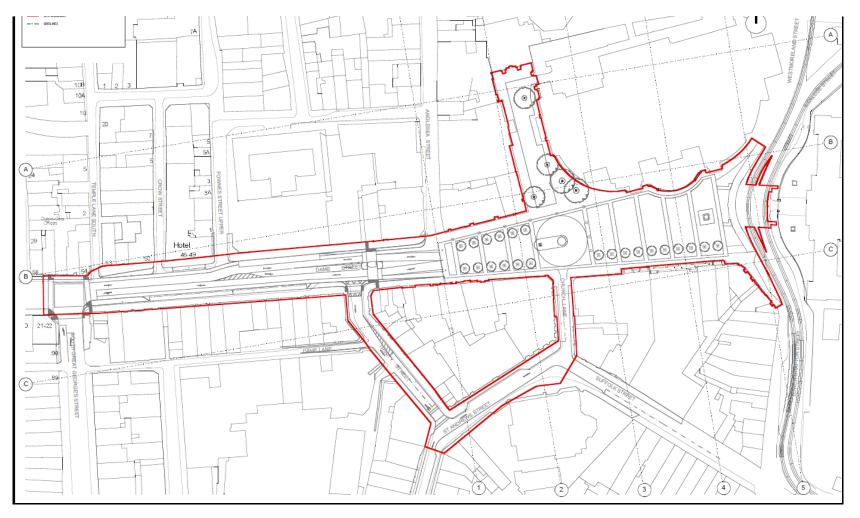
The Proposed Project (Refer to Figures 4.4 - 4.9 for details on road design. Refer to Figure 4.11 for more detail on the plaza layout)
